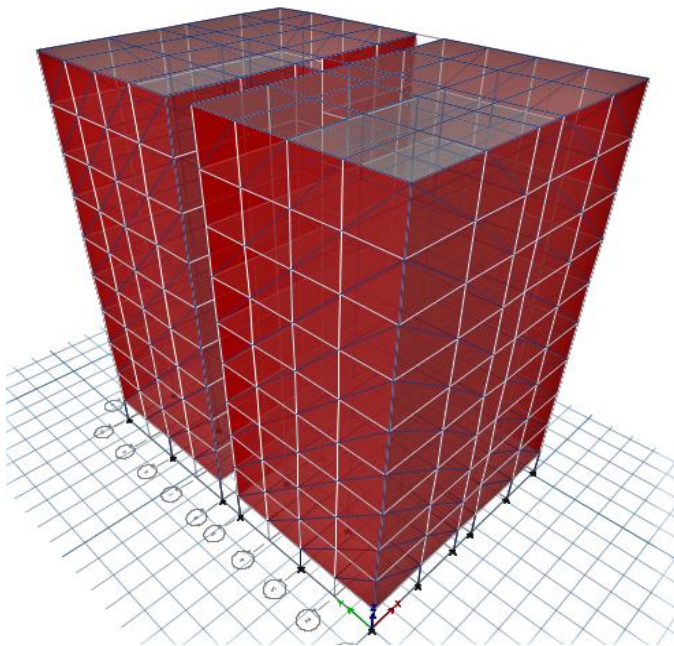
3Dview of model4 (G+9) multistoried bare frame building with bracing in EN code
